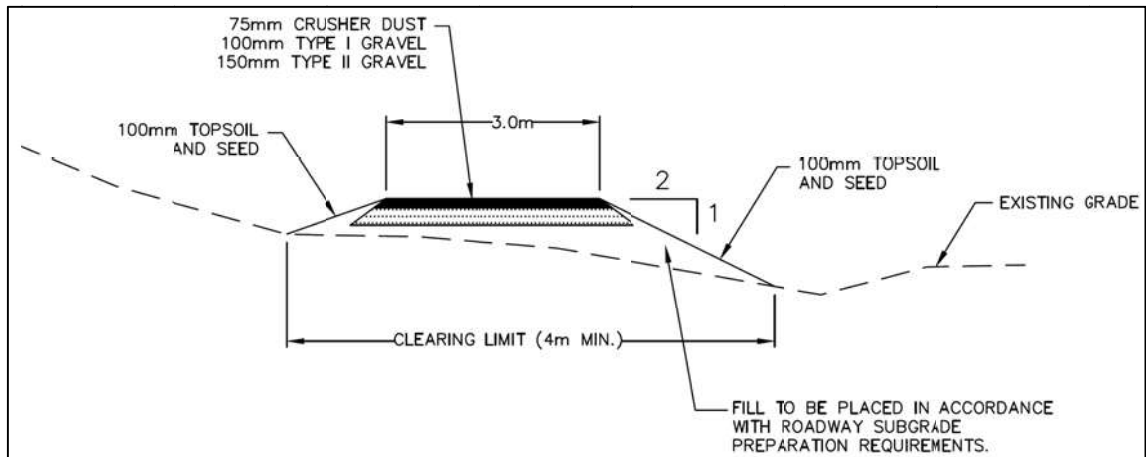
Typical Greenway Cross Section with Large Separation from Highway
